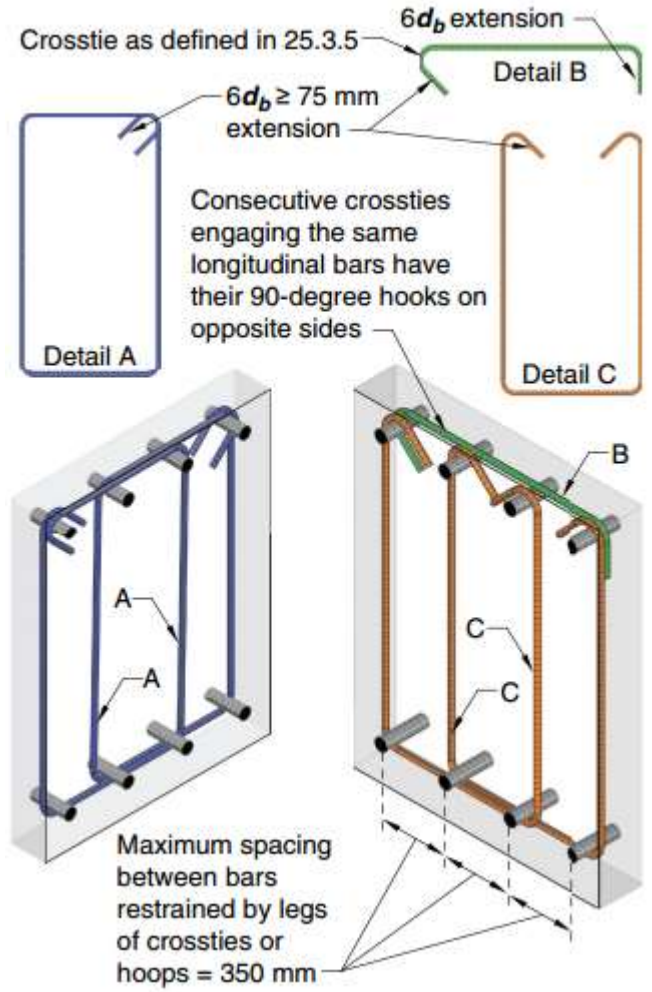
Examples of overlapping hoops and illustration of limit on maximum horizontal spacing of supported longitudinal bars.
